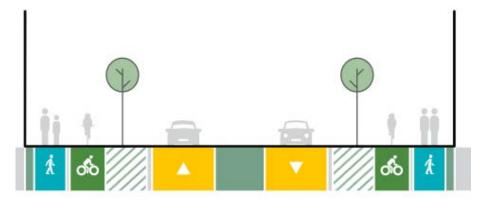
CFAF Outcome - Spedding Road West Indicative 24m cross section
